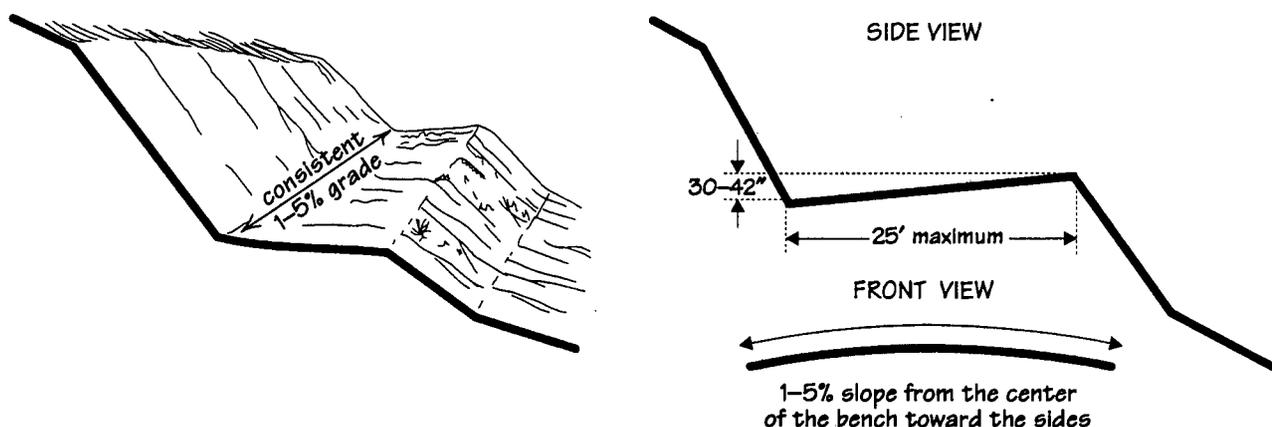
Benching and terracing of unconsolidated material to control runoff. Benches cut in overburden or other material likely to erode should be sloped into the hillside (side view) and away from the center of the bench (1-5% slope or grade) to allow drainage to either side (front view). (Modified from Law, 1984. Copyright © 1984 by Van Nostrand Reinhold Company Inc. Used by permission of the publisher.)
